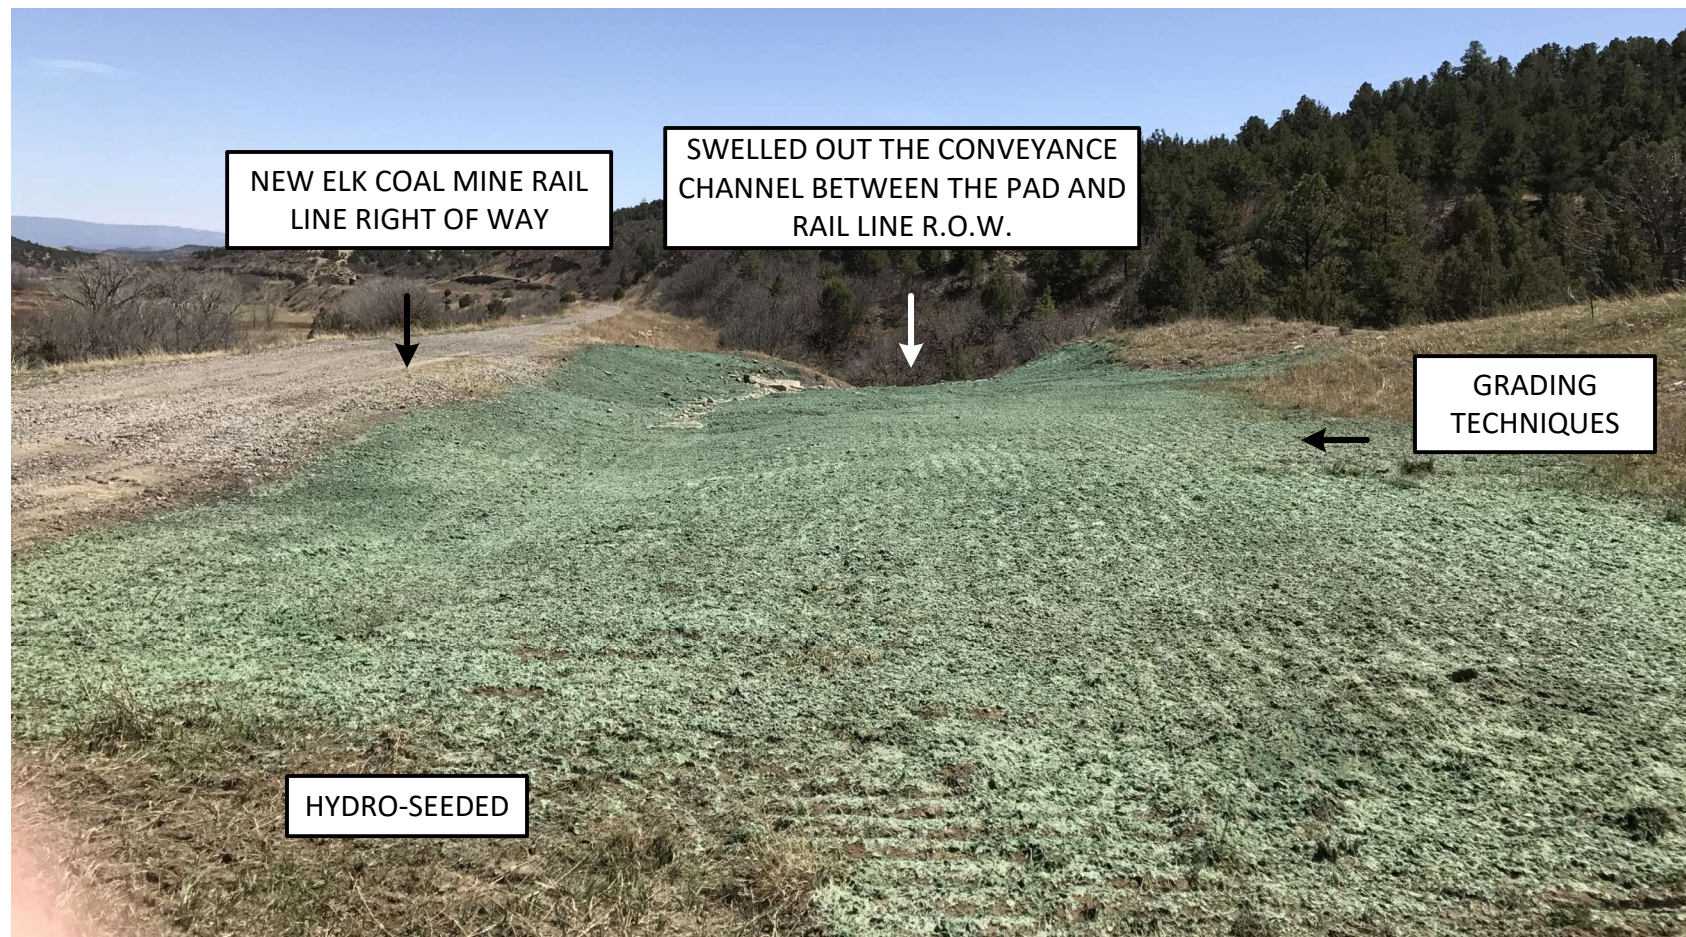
FACING EAST ACROSS THE GOLDEN EAGLE MINE 28-12 (SD-1) PAD RECLAMATION. THE LOCATION SIGN, PIPELINE RISERS, ROOF ANCHORS, CONCRETE CHUNKS AND REBAR WERE ALL REMOVED FROM LOCATION. THE PAD WAS RECONTOURED TO BETTER MATCH THE SURROUNDING TERRAIN. GRADING TECHNIQUES WERE INSTALLED ON THE CONTOUR. THE EARTH DISTURBANCE WAS HYDRO-SEEDED WITH AN APPROVED COLORADO PARKS AND WILDLIFE (CPW) SEED MIX TO PROMOTE THE ESTABLISHMENT OF VEGETATION.
